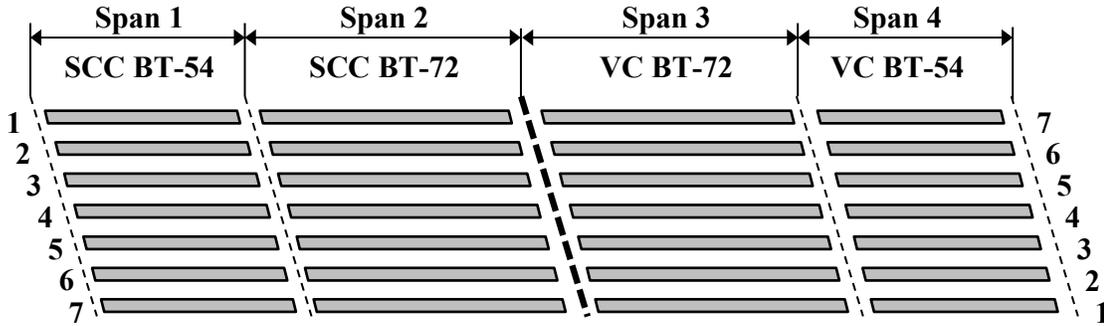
Girder and span numbering for bridge over Hillabee Creek
